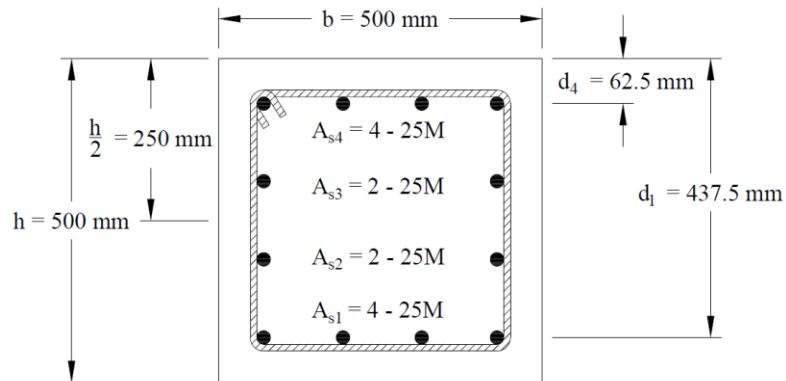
Slender Reinforced Concrete Column Cross-Section
